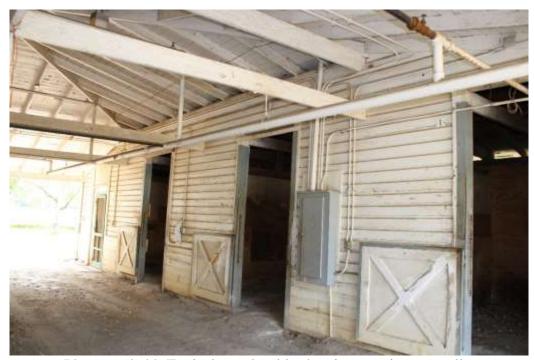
Typical wood stable showing windows on short end illuminating the tack rooms.
